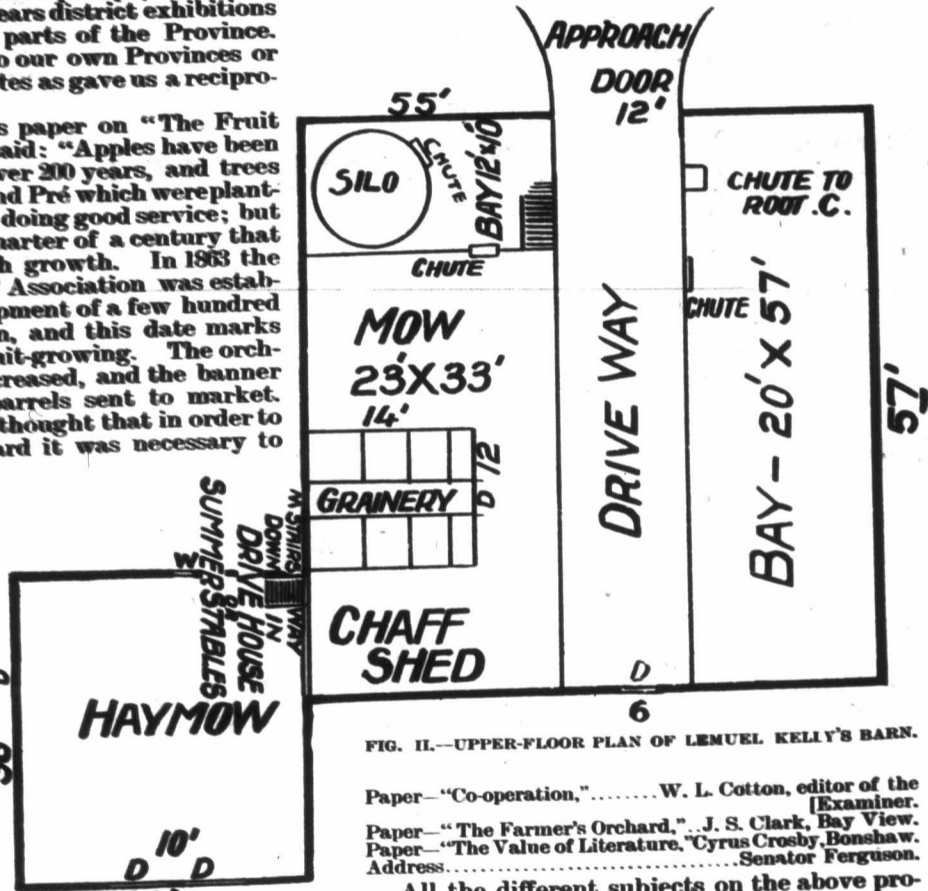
FIG. II.—UPPER-FLOOR PLAN OF LEMUEL KELLY'S BARN.
